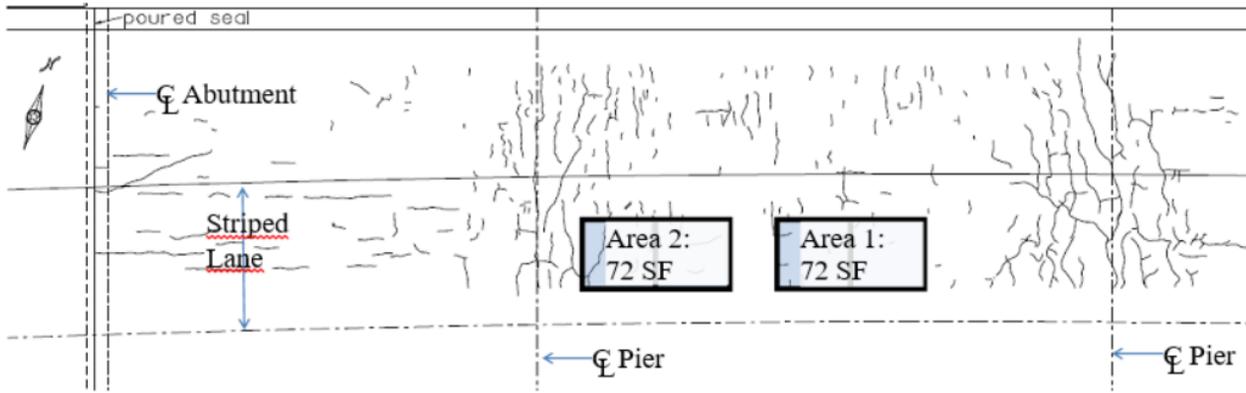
Illustration of crack mapping areas that will be used to characterize general cracking condition of the bridge deck surface.
